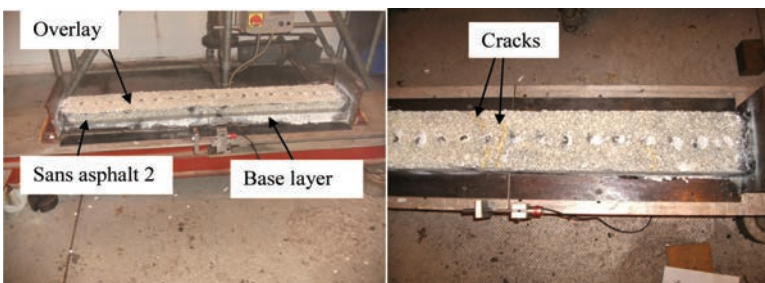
Photographs of the specimen incorporating sand asphalt 2 (a) before test (b) after test.
